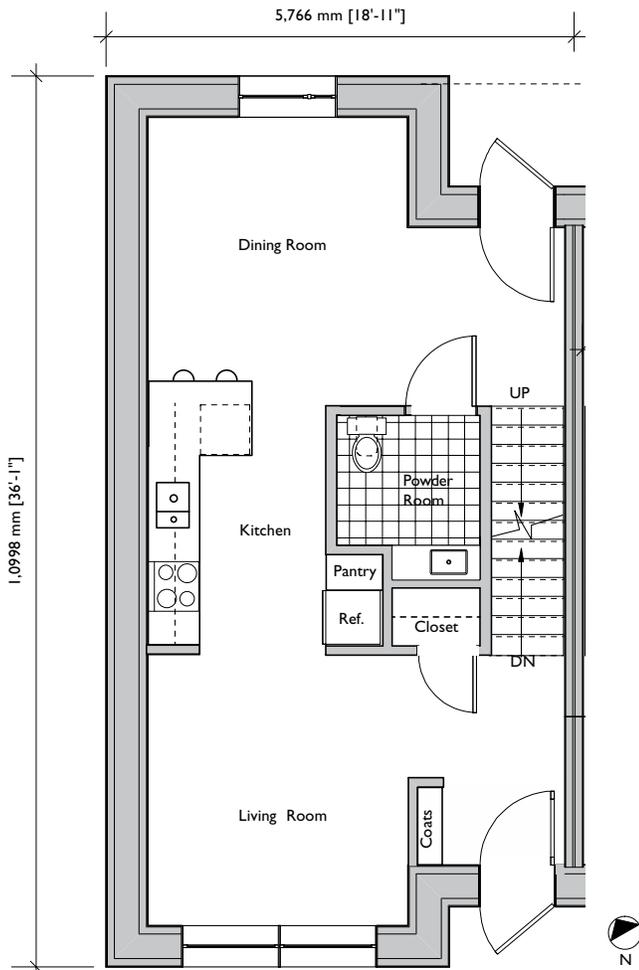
Main floor plan of the Urban Ecology EQUilibrium™ Housing unit
